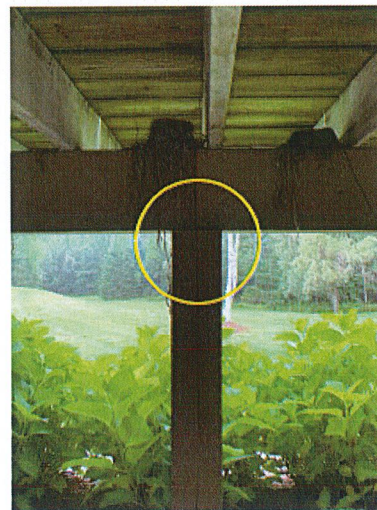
Wooden support posts are not securely fastened to beams above. A qualified contractor should evaluate and make repairs as necessary, such as installing metal ties, bracing with lumber, and/or gussets as per standard building practices.
